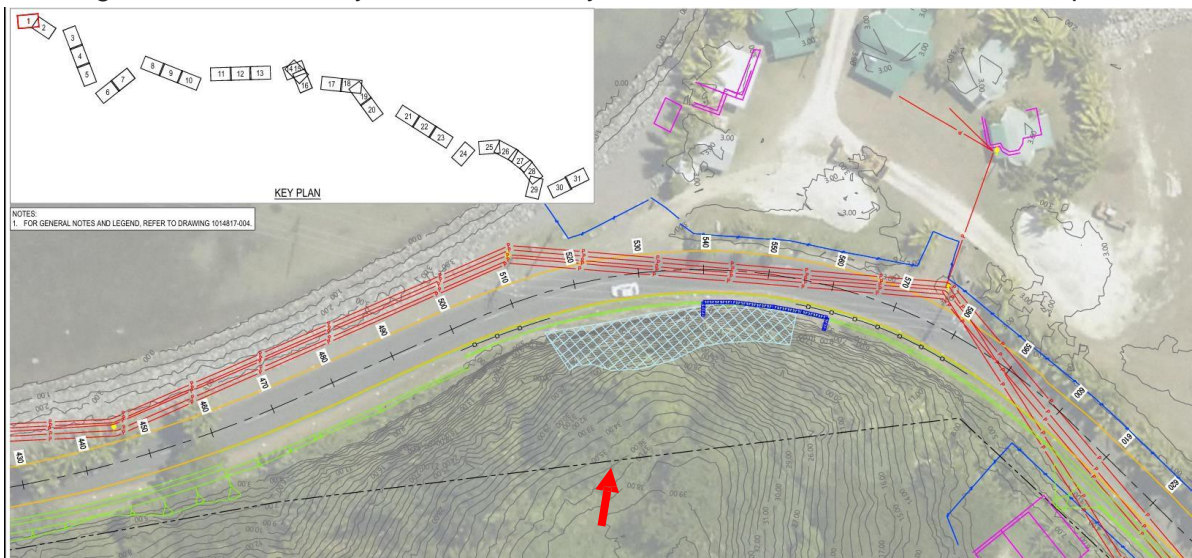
CAD for Solosolo Site 26-29 (existing road as the road boundary - Section 58 of LT Act 1964)
